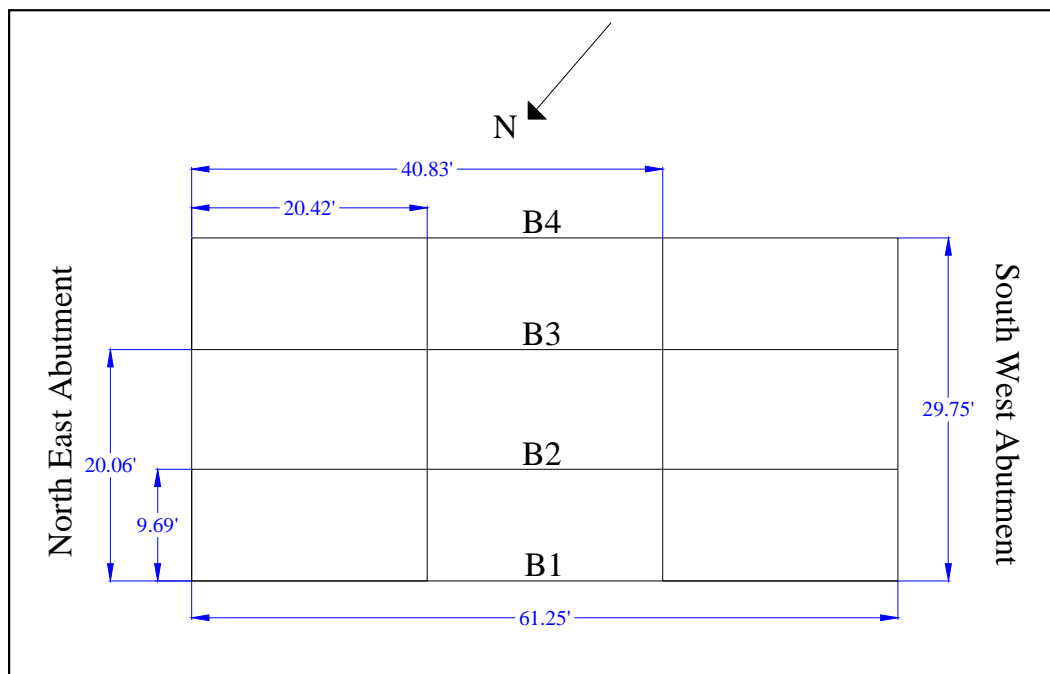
Plan view of tested field bridge (FHWA # 31690)
